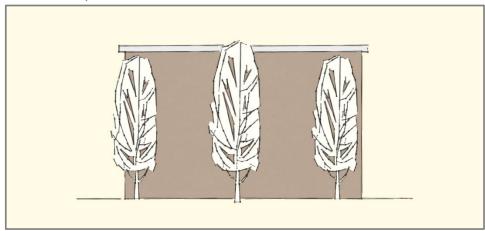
an example of articulating blank walls with plantings as per 60.2.2(2)(b) of this section.
